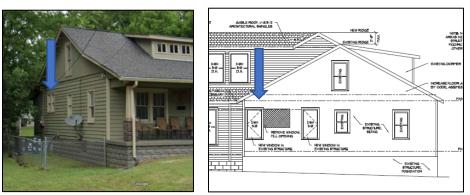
(left) shows the existing window opening and Figure 5 (right) shows the proposed new opening.
